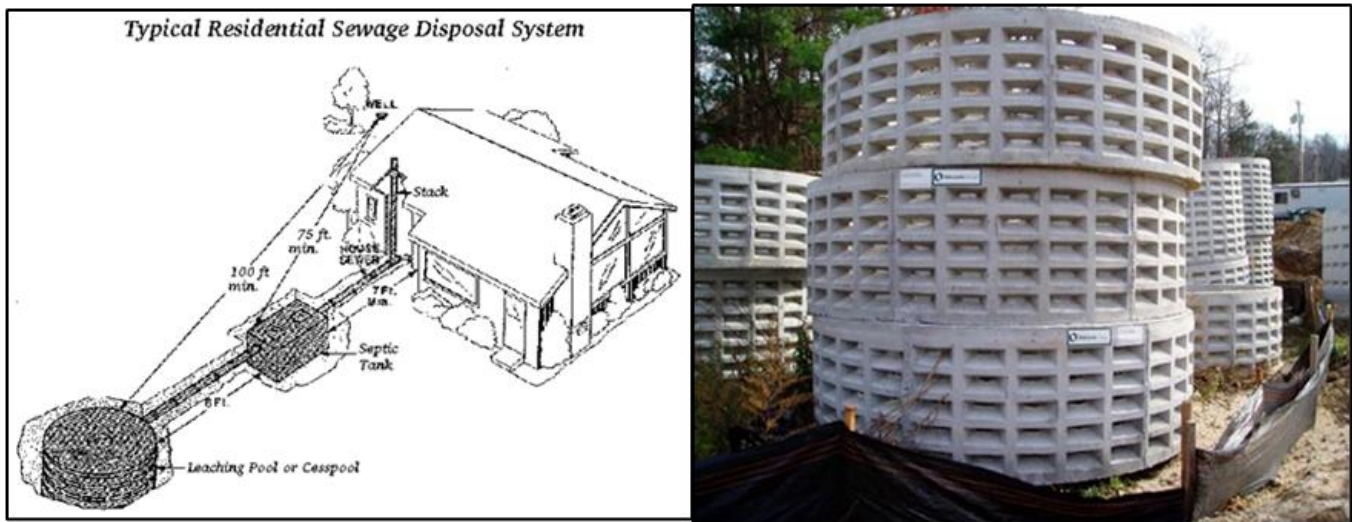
Typical On-Site Wastewater Treatment System (Left) & Precast Leaching Rings (Right) (Source: Suffolk County Subwatershed Wastewater Plan, 2015)
